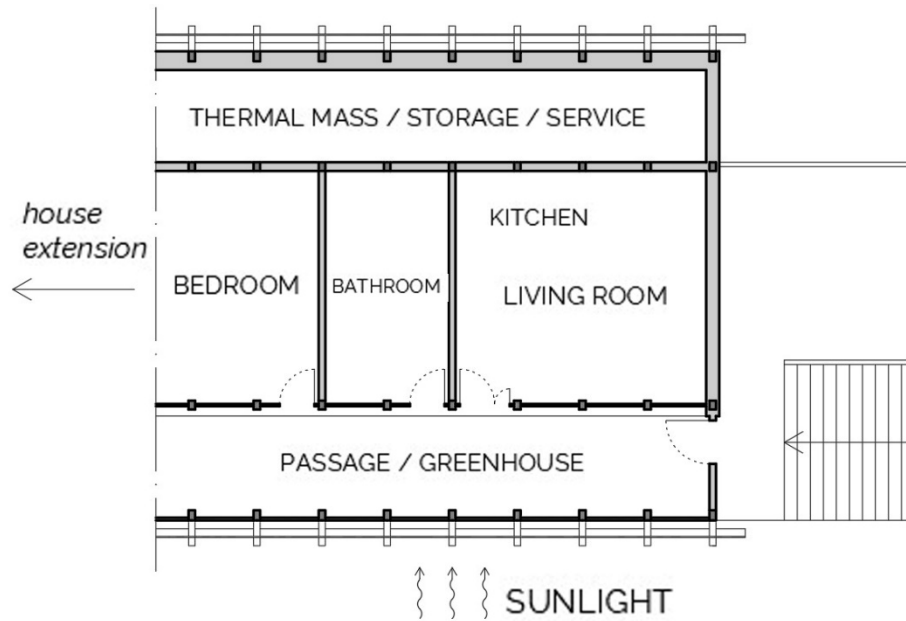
Model floor plan, with a possible distribution of rooms by adopting passive design strategies.
